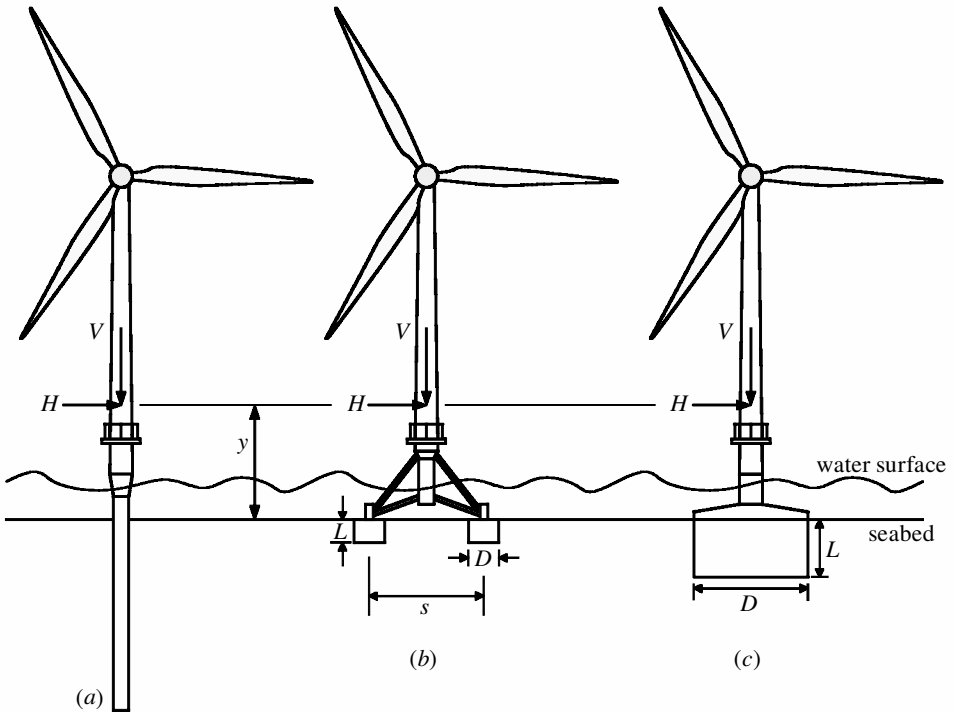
Proposed structures for offshore wind-turbine applications: (a) piled foundations (option A); (b) suction caisson multi-foundation structure (option B); and (c) suction caisson monopod (option C).
